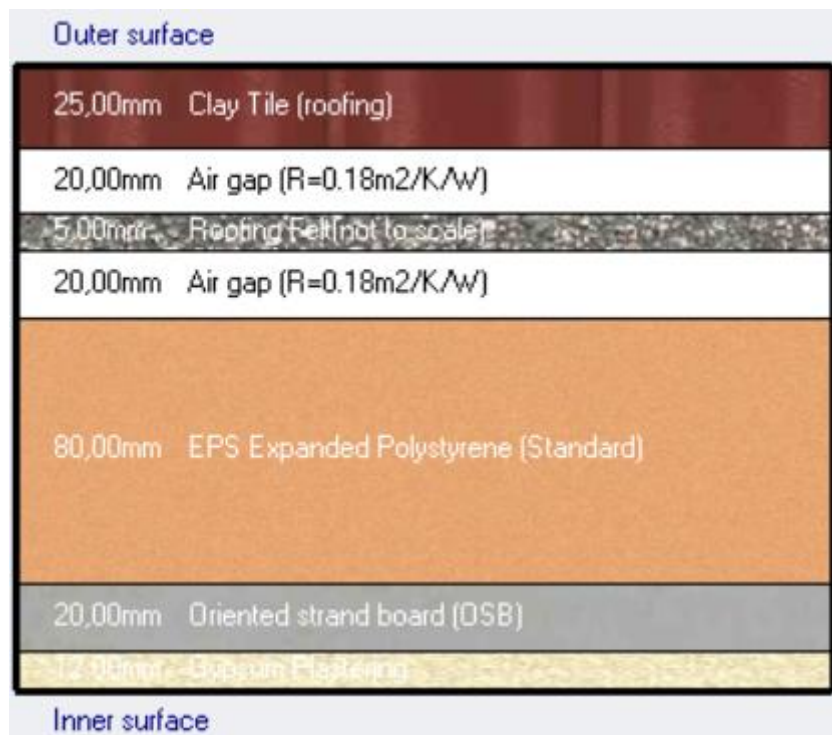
Detail of the roof of the freestanding house in DesignBuilder (low insulation)
